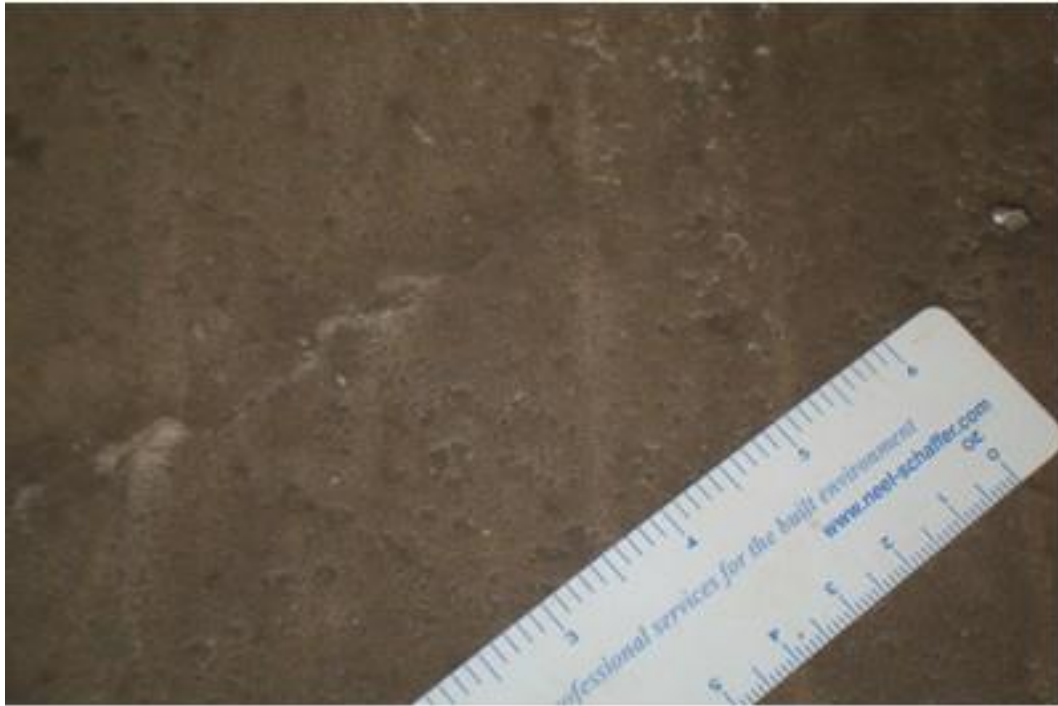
Cracks on south span girder, north end, 4th beam from east side, west face (#7933).
